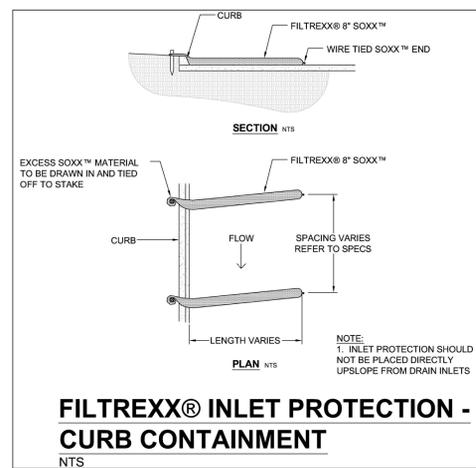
Engineering Design Drawing for Curb and Drain Inlet Protection
